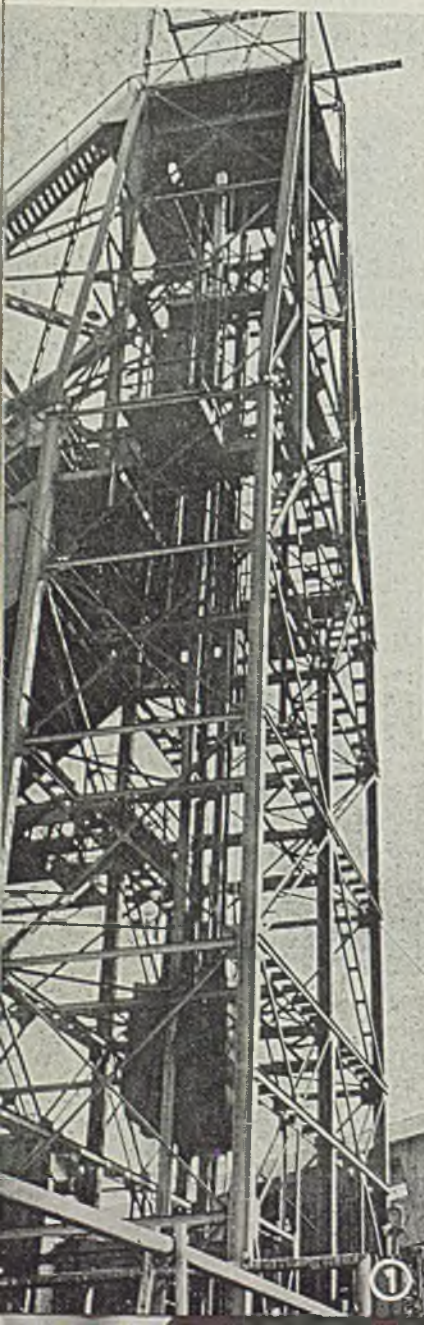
Hamilton shaft head frame where coal is hauled from mine to surface and conveyed to crusher house
